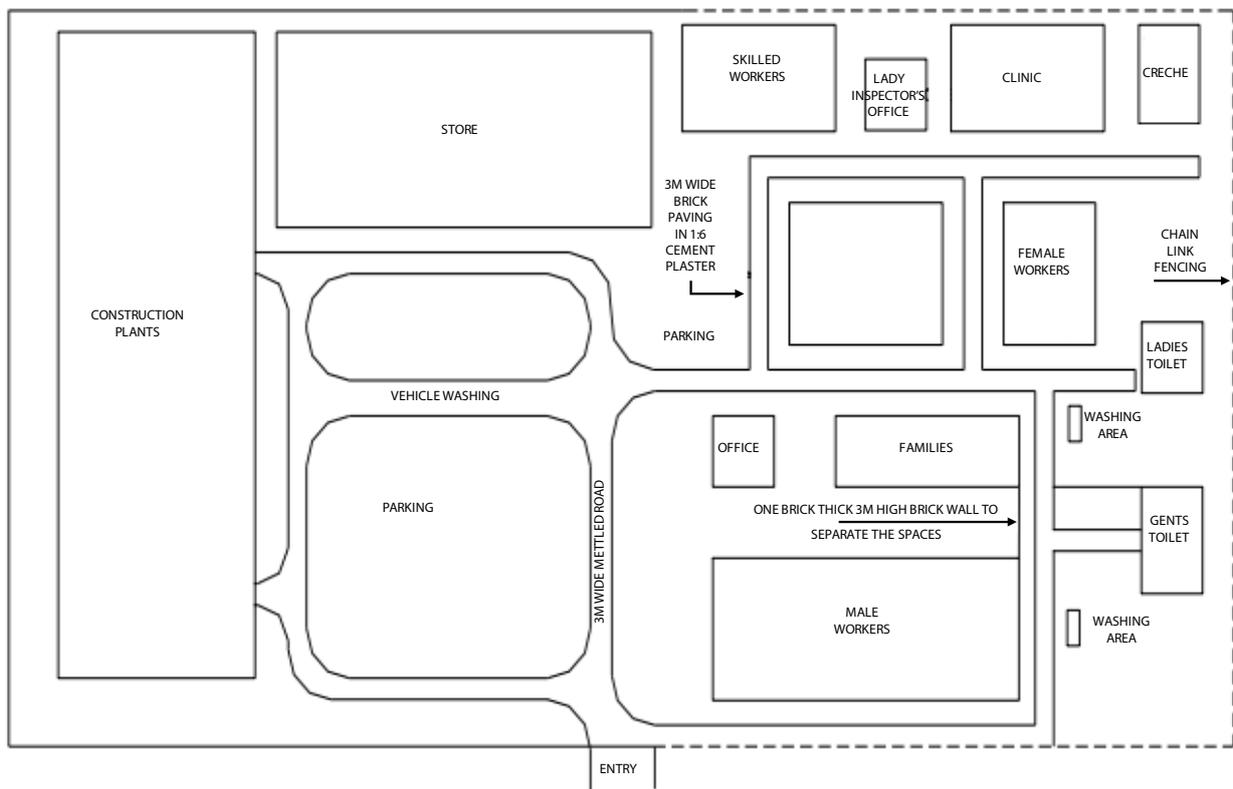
Typical layout of Construction Camp for a government-funded project (from an NHAI Tender)
